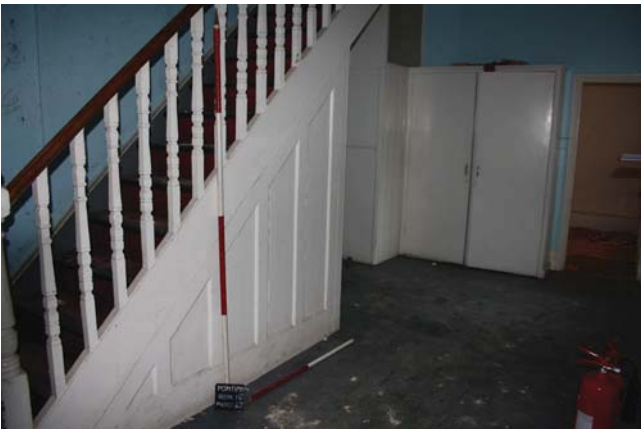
Room 16, view to stairs and room 17, looking north east, Scales: 2m and 1m.
